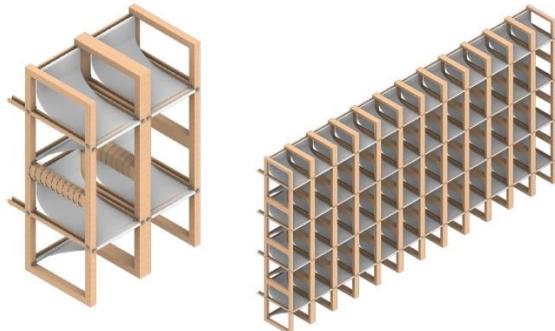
Team 2 developed their first prototype with a space frame wall system.
